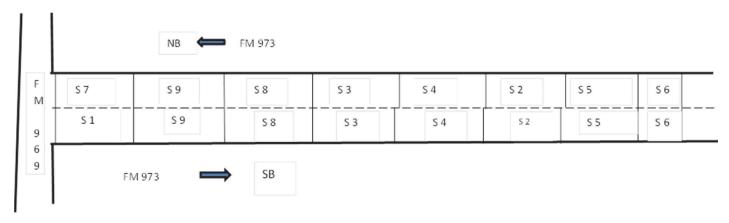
Schematic layout diagram of the Texas field site test sections (not to scale).
